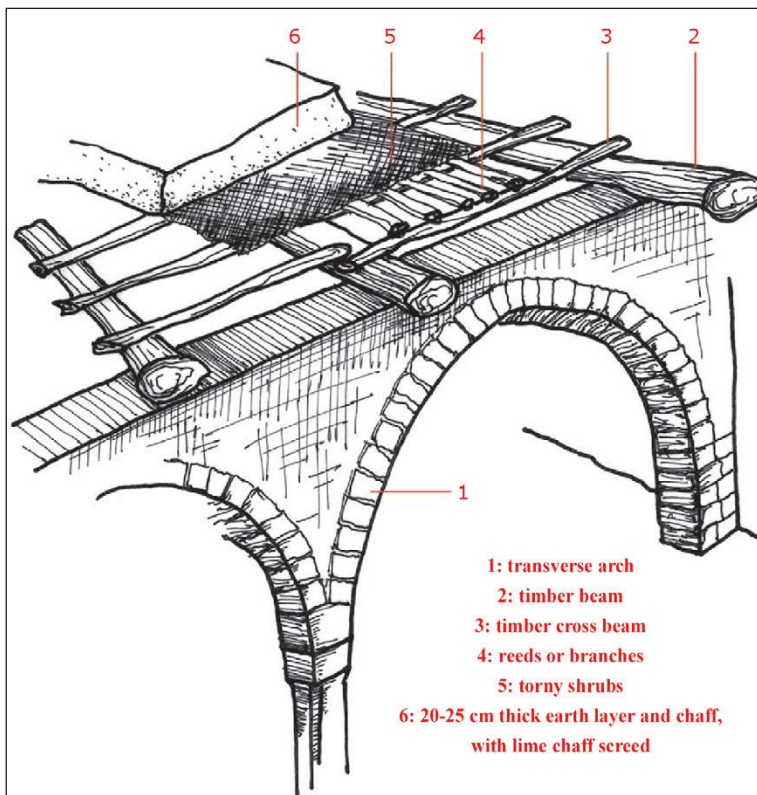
Earthen roof construction layers from a traditional house (from HELMEDAG, JÄGER 2012).
